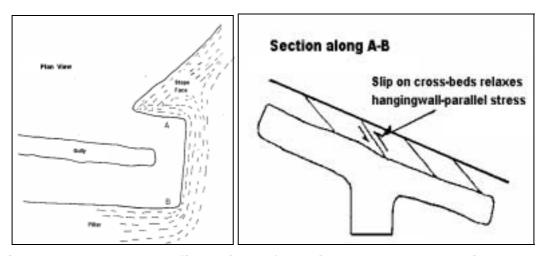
The configuration of a wide advanced heading and a strongly underhand face as used at ERPM (after Turner, 1987).
